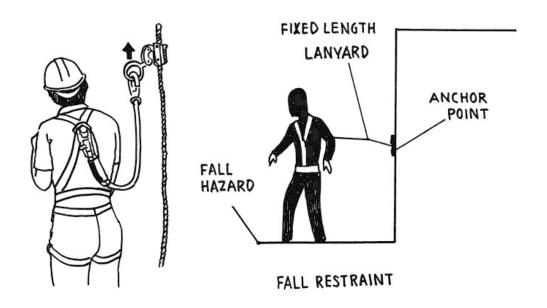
Fall Restraint and Fall Arrest System for Construction Workers
